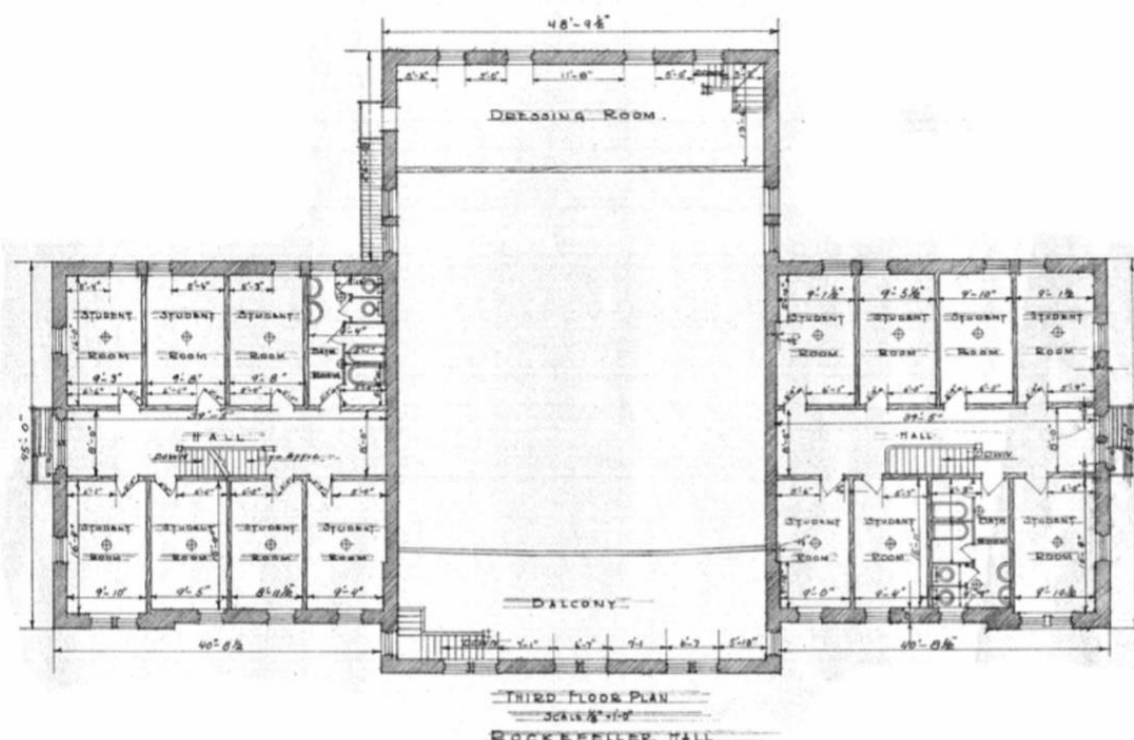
Floor plan of Rockefeller Hall's third floor. Note the chapel again is the center of the building and dominates this floor. (Rockefeller Hall Third Floor Plan, Clement and Wynn Program Managers, *Spelman College Campus Heritage Plan* (Atlanta, Georgia, 2005), 10.)
